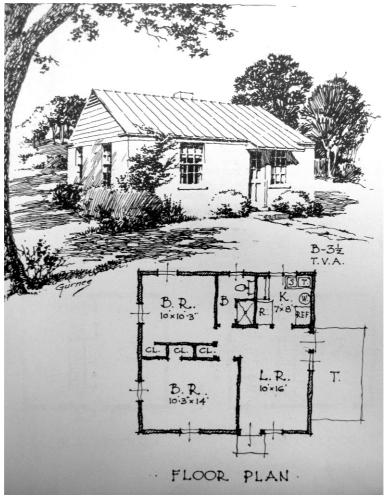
Plan and Sketch of a House in Norris, Tennessee (Source: TVA Archive, National Archives Building, Atlanta, GA, Collection RG 142, Box 12, Folder: TV-48514 – Geo. G. Oakley)
